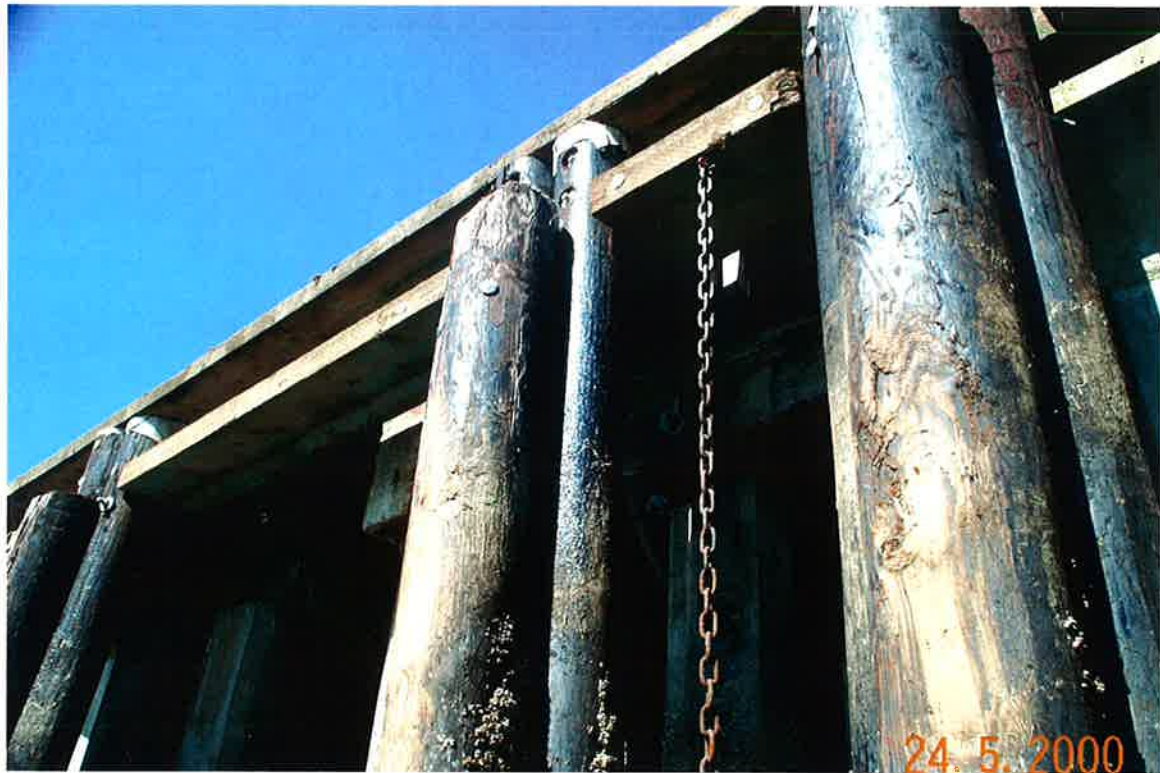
Fungal decay and mechanical damage at the top of the rub pile.
